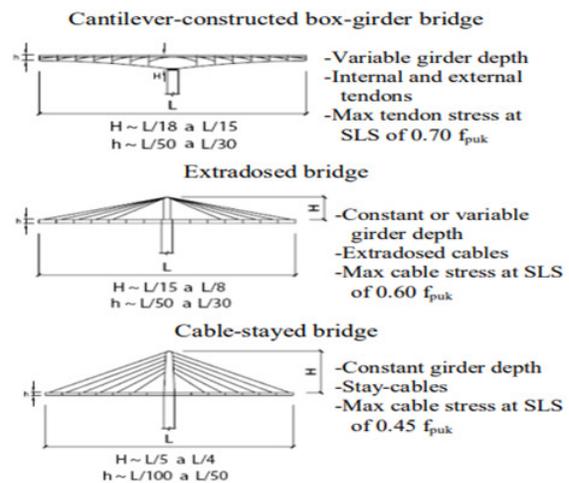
Comparison among prestressed bridges, extradosed and cable-stayed bridges
